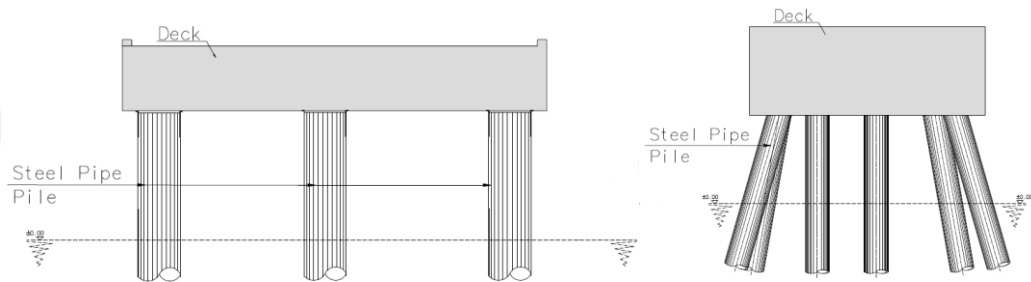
Cross-section of a dolphin structure, (a) Vertical piles, (b) Batter piles
